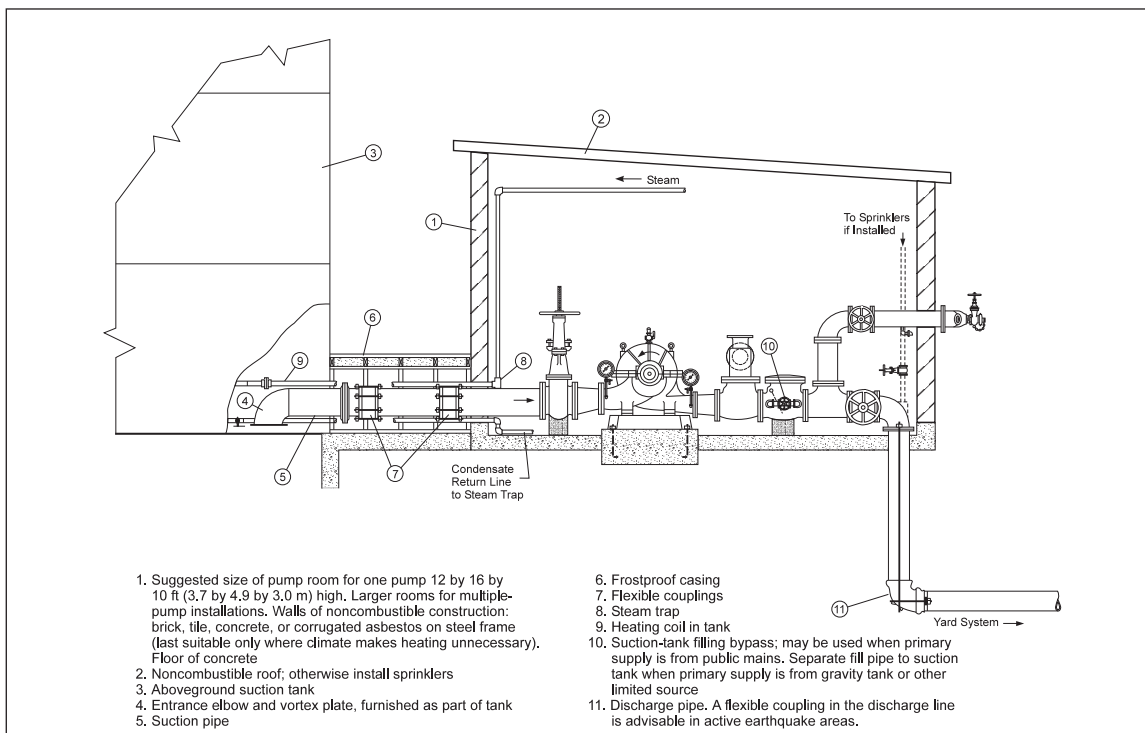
Typical horizontal-shaft fire pump installation with suction from aboveground tank
